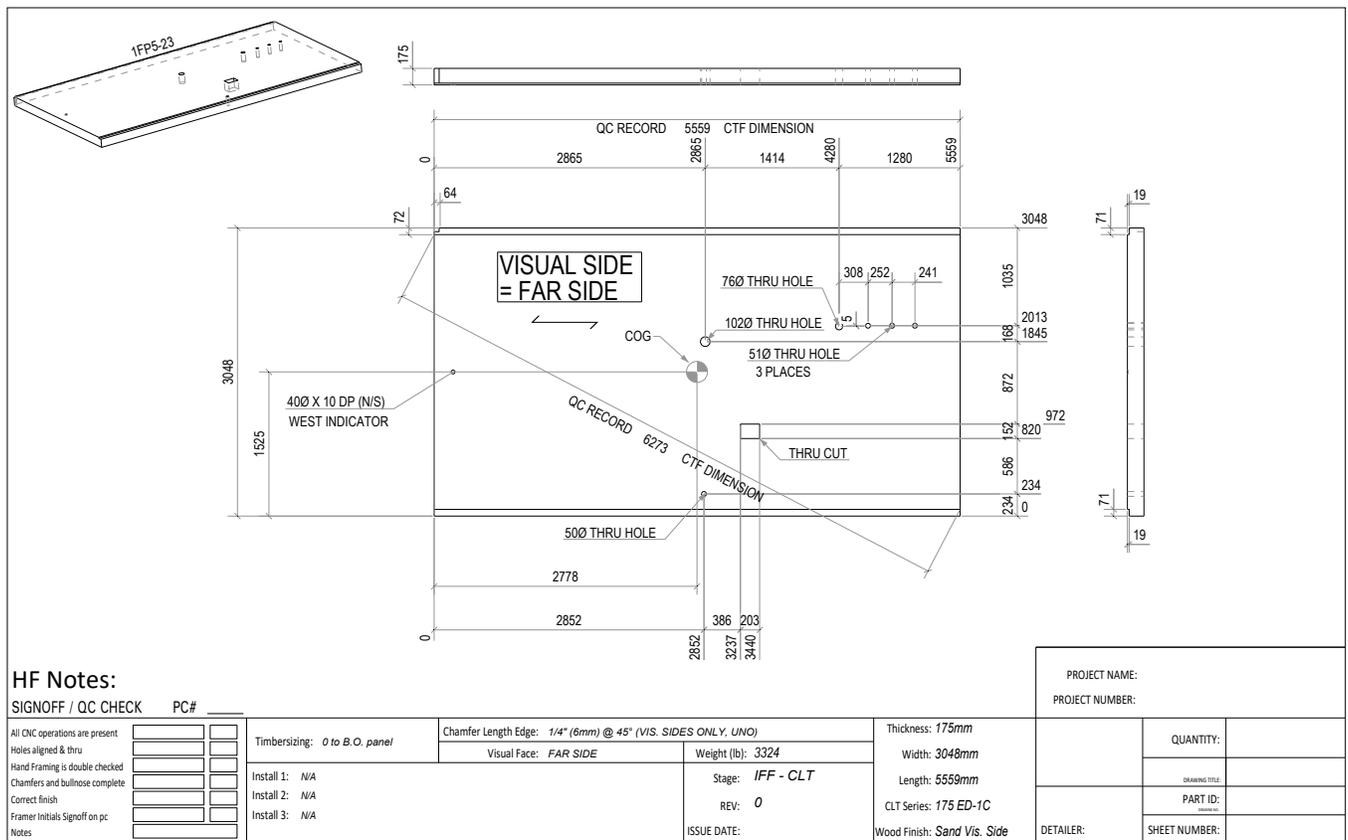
Critical to Fit Dimensions marked on a shop drawing for QC Review.
